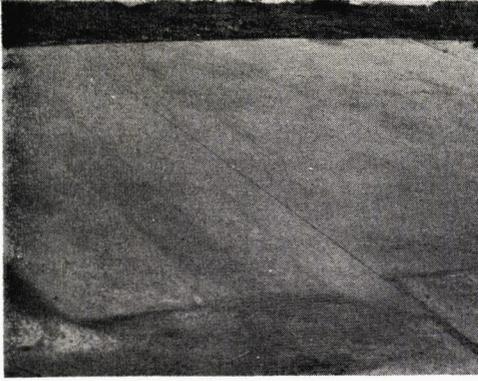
A longitudinal contraction joint, cut with a concrete saw in a thin concrete patch.
